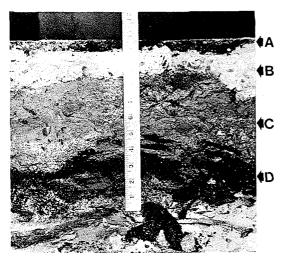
Section through floor into underlying shale (scale in inches, 1 in. = 2.5 cm). (A) Tiles and bitumen; (B) toplayer of concrete; (C) mushy concrete; (D) weathered shale.
